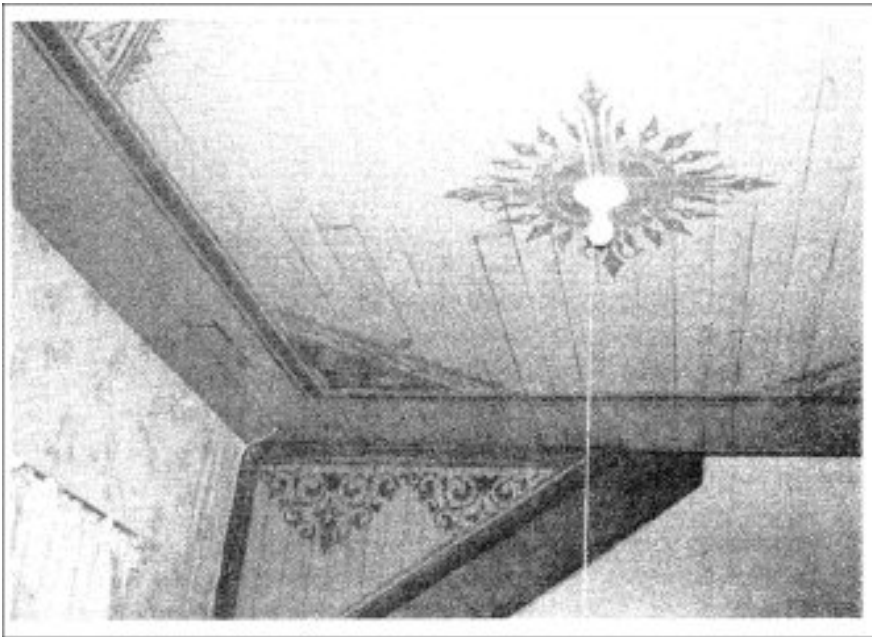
Meady White House parlor, central hall, decoratively painted ceiling and stair enclosure
